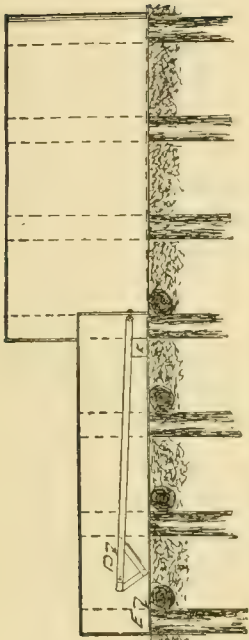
Side elevation of barricade shown in figures 2 and 3.
